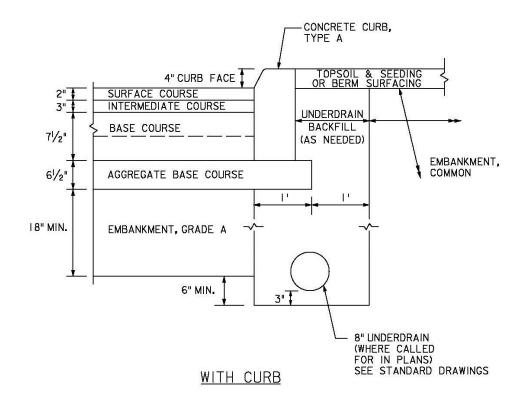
13: TURNPIKE CAR PARKING PAVEMENT SECTION
